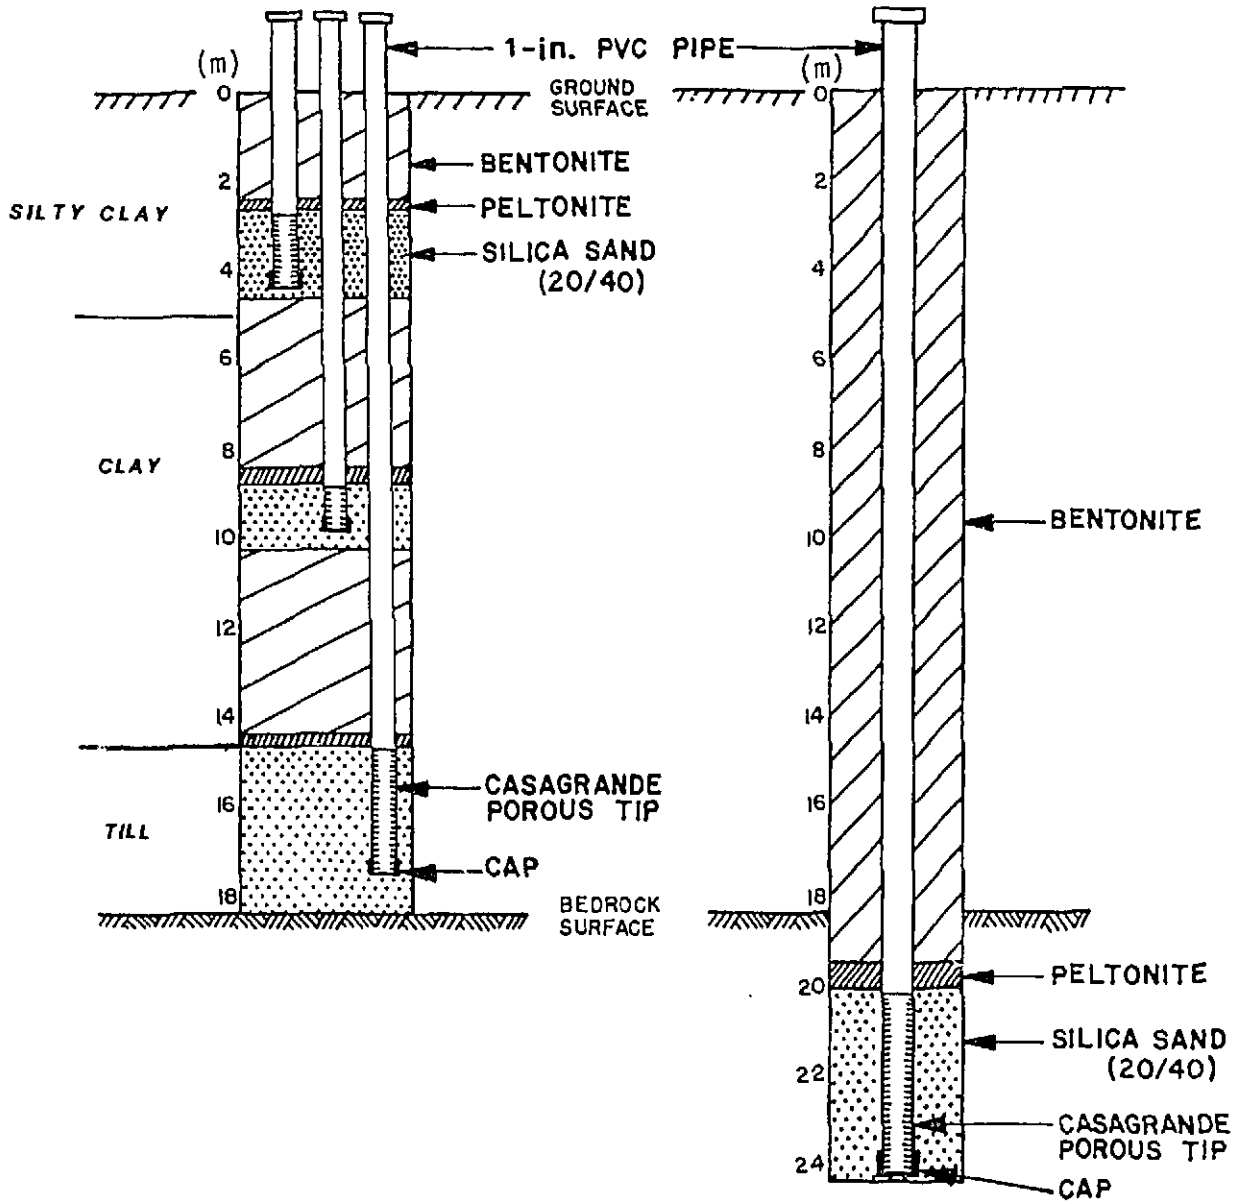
Typical Installations for Overburden Piezometers and Bedrock Monitoring Wells
